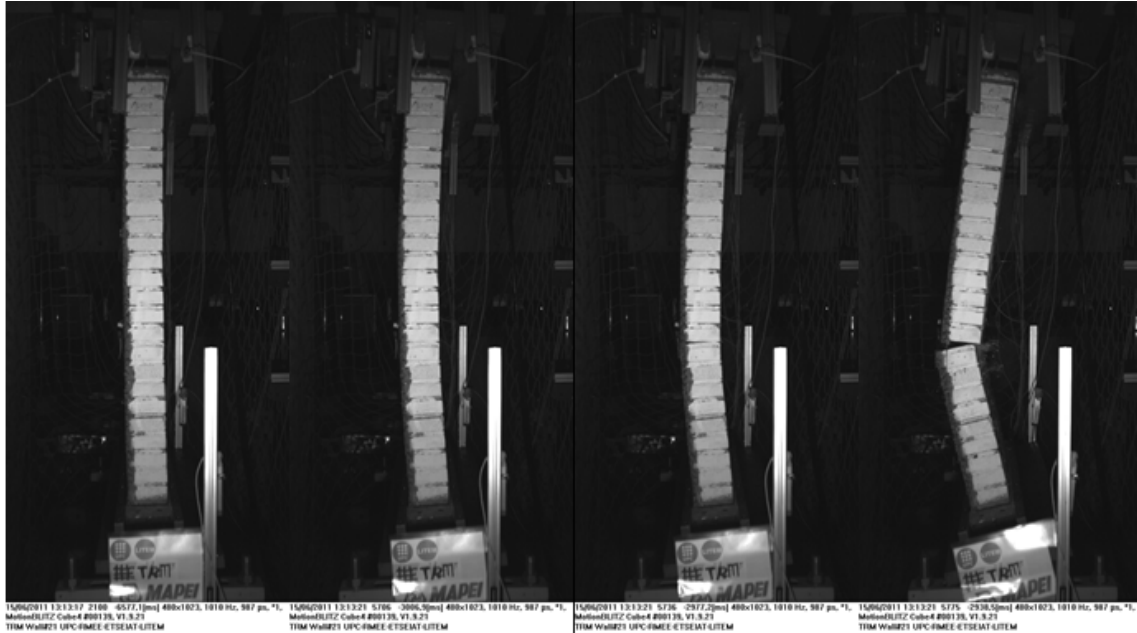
196 Failure of the wall W#21. TRM tensile fracture and horizontal joint opening
